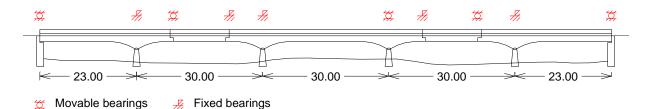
Layout of the Huamani bridge (downstream direction)
